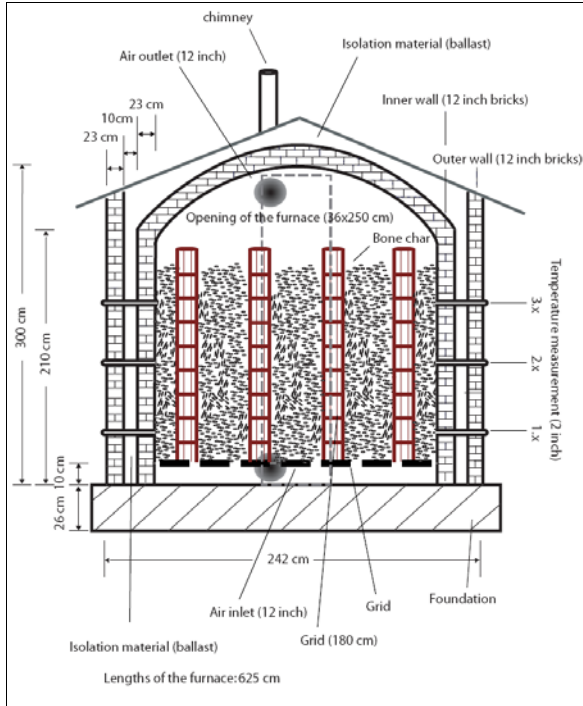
Sketch of the furnace that was designed and constructed by CDN WQ in 2005.
